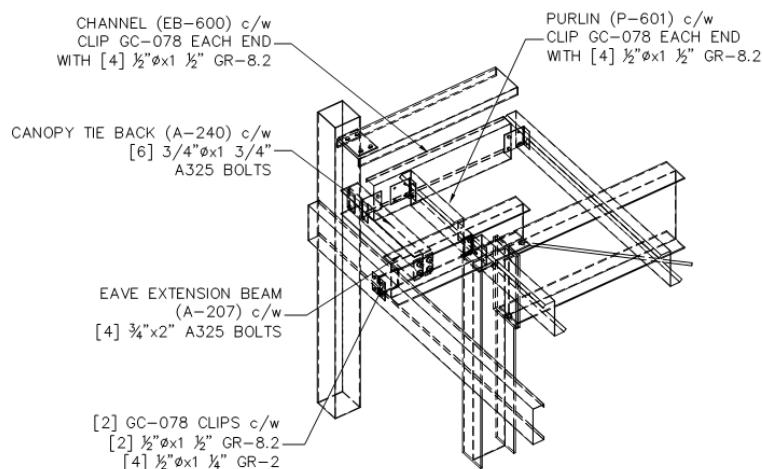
Example of ISO view from 3D model added to 2D erection drawings
